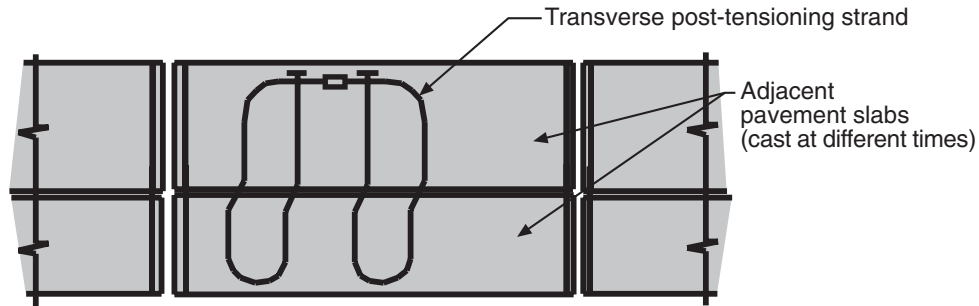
Transverse prestressing scheme for the prestressed pavement developed by CTR (Ref 6)
